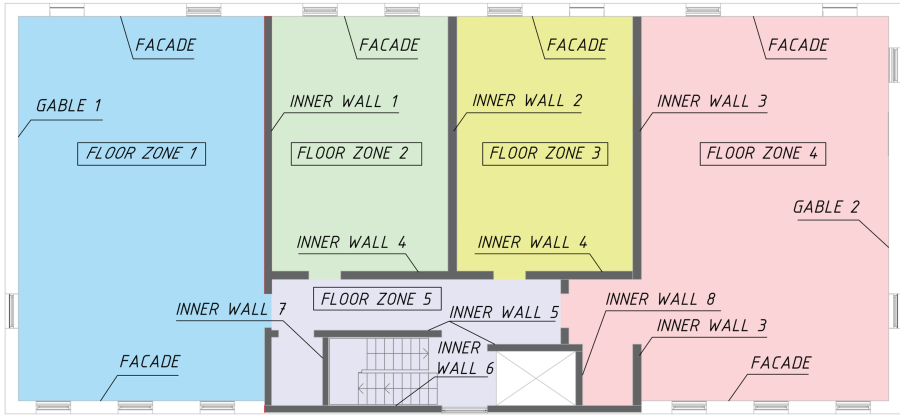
Zoning and element division for the reference building used in the GA prototype. The floors (and roof) were divided into five zones; load-bearing inner walls into eight elements; non-load-bearing façade on the long sides into one element; and gable walls into two elements. Source: Authors' own work
